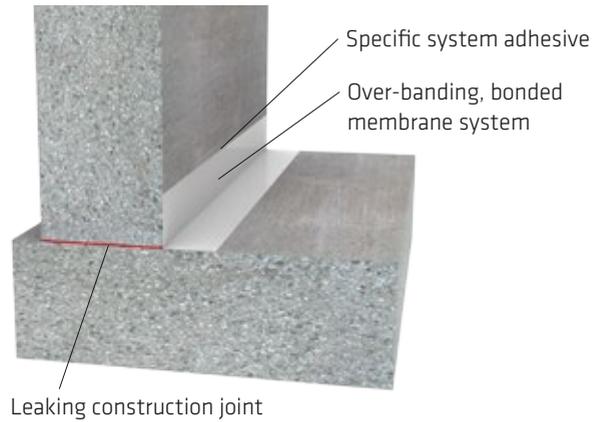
Sealing of a construction joint with an over-banding membrane bonded to the concrete
